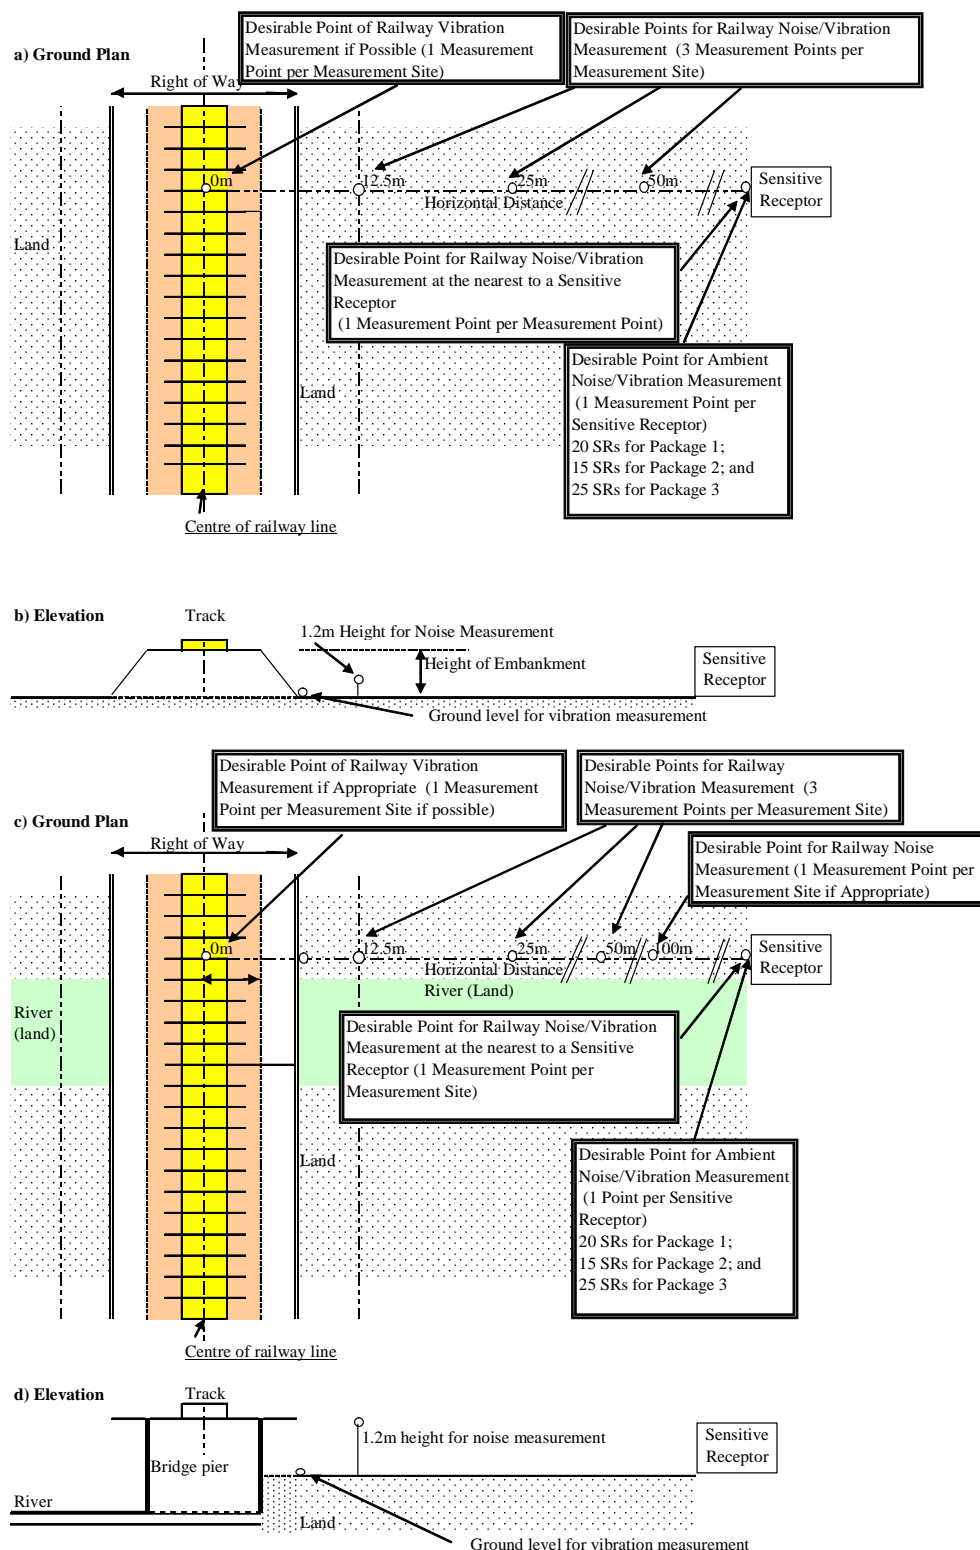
Schematic Plan & Elevation of Railway, Ambient Noise and Vibration
